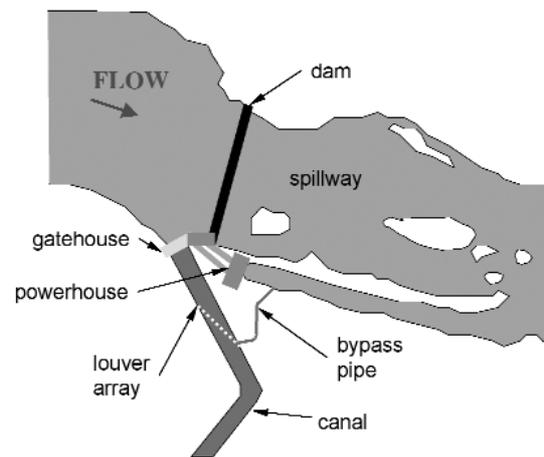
Site plan, Turners Falls Dam, Connecticut River, Massachusetts, USA.
